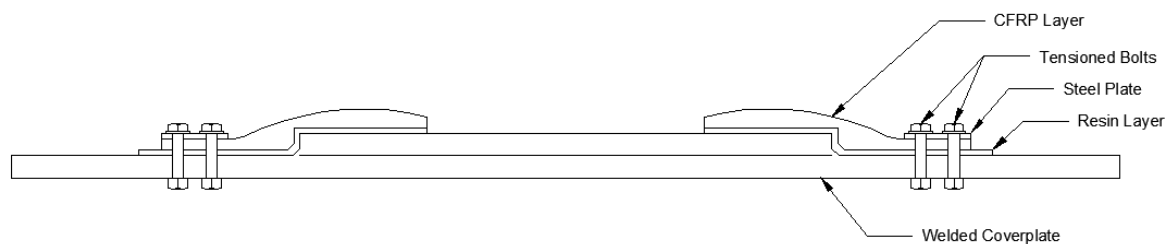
Welded cover plate with proposed bolted CFRP retrofit
